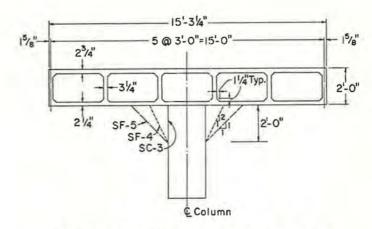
Cross sections of single-column bents SC-3, SF-4, and SF-5.
